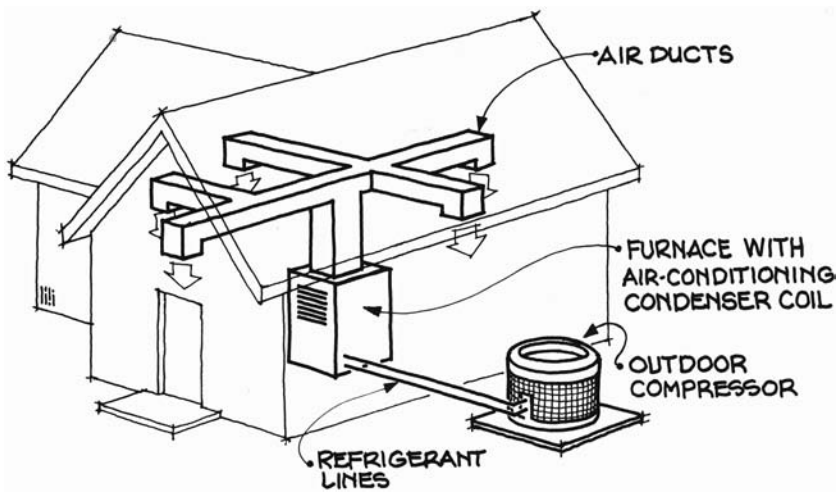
Cooling of building interiors can be done with a refrigeration system that transfers interior warm air to the exterior, thus cooling the building space.
